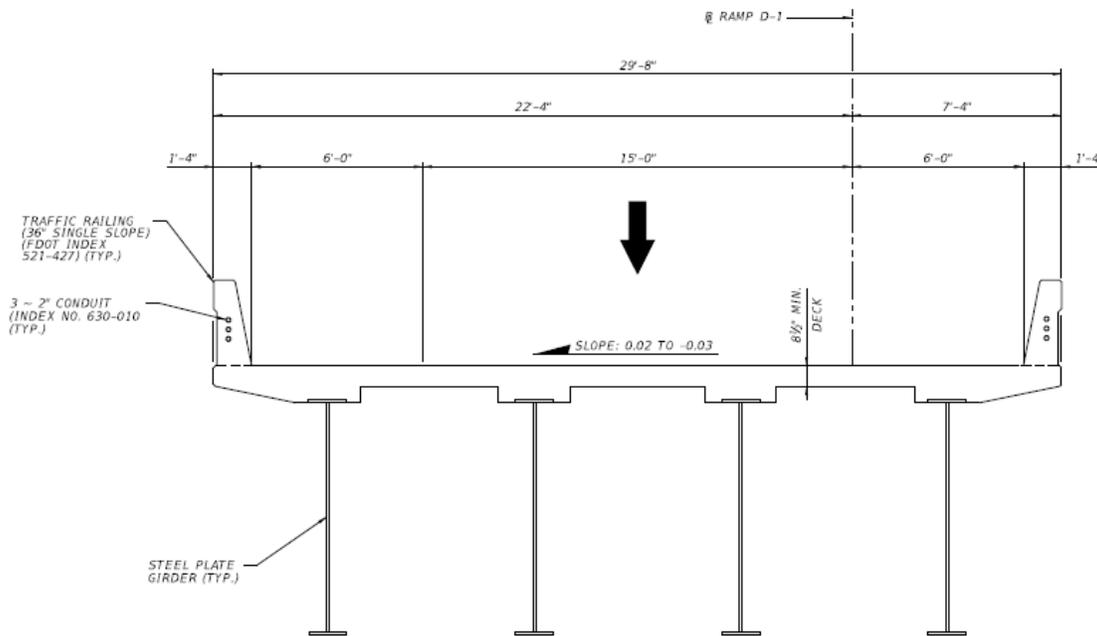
Bridge Typical Section (Bridge No. 15)
